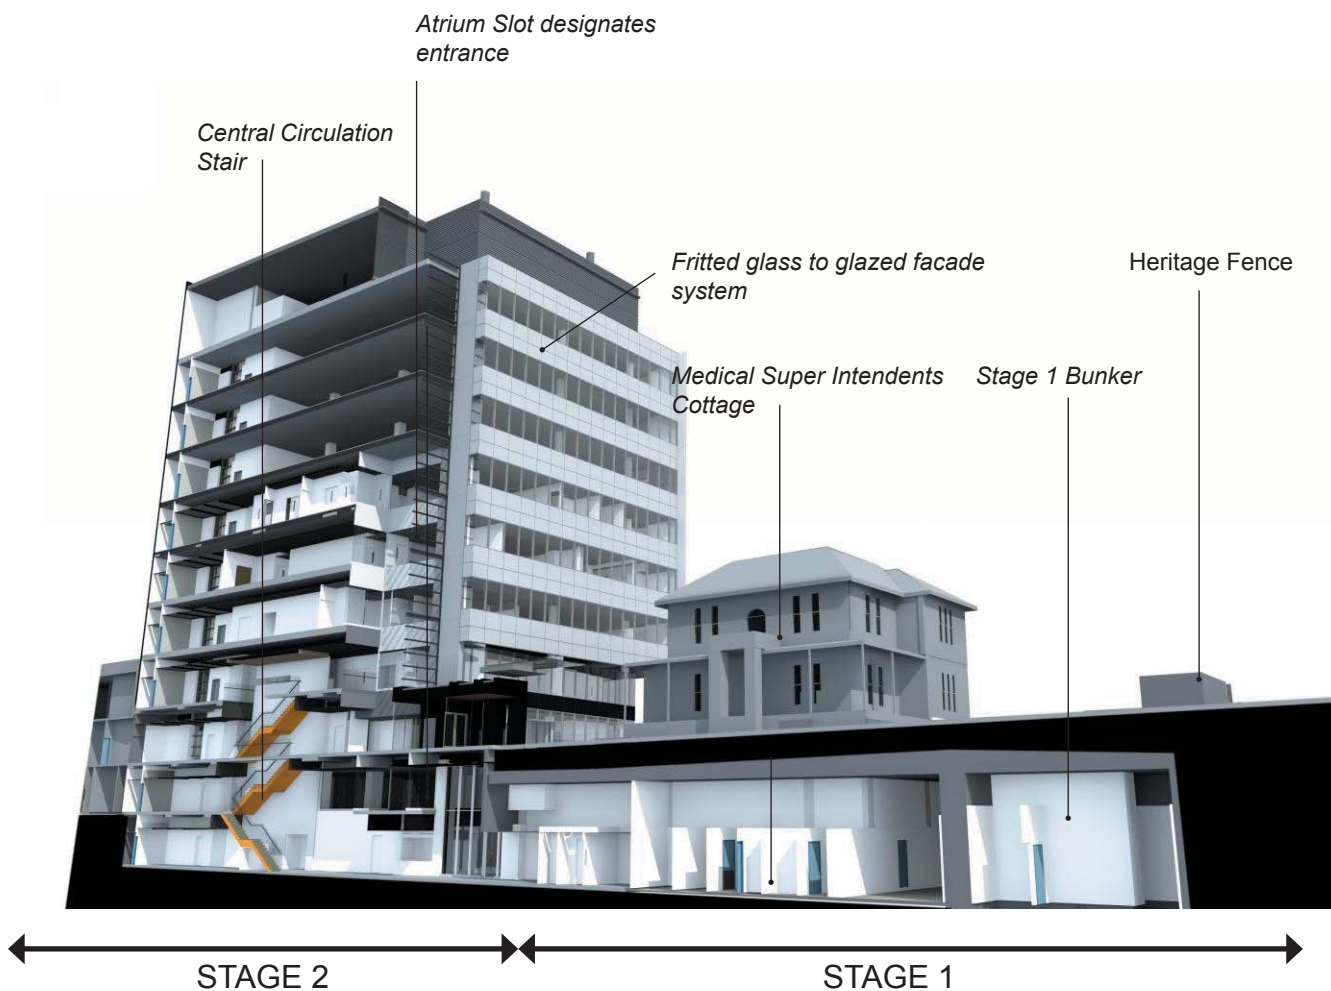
Cross section through new building highlighting link between Stage 1 & Stage 2
